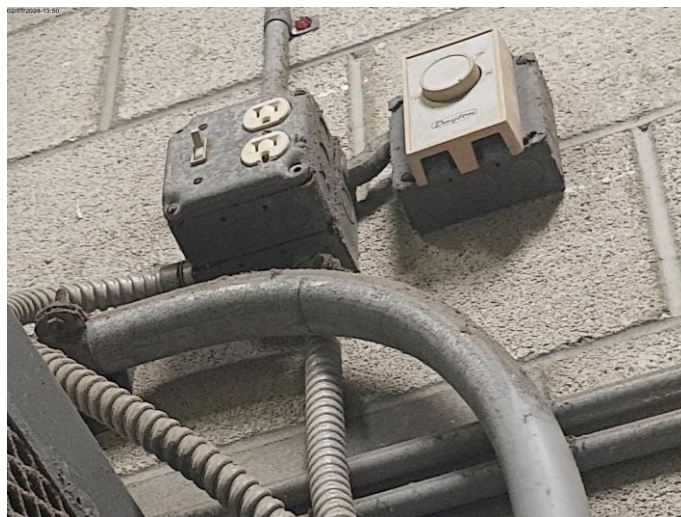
Item 17.d. Pump Room. Missing GFCI protection for receptacles.
